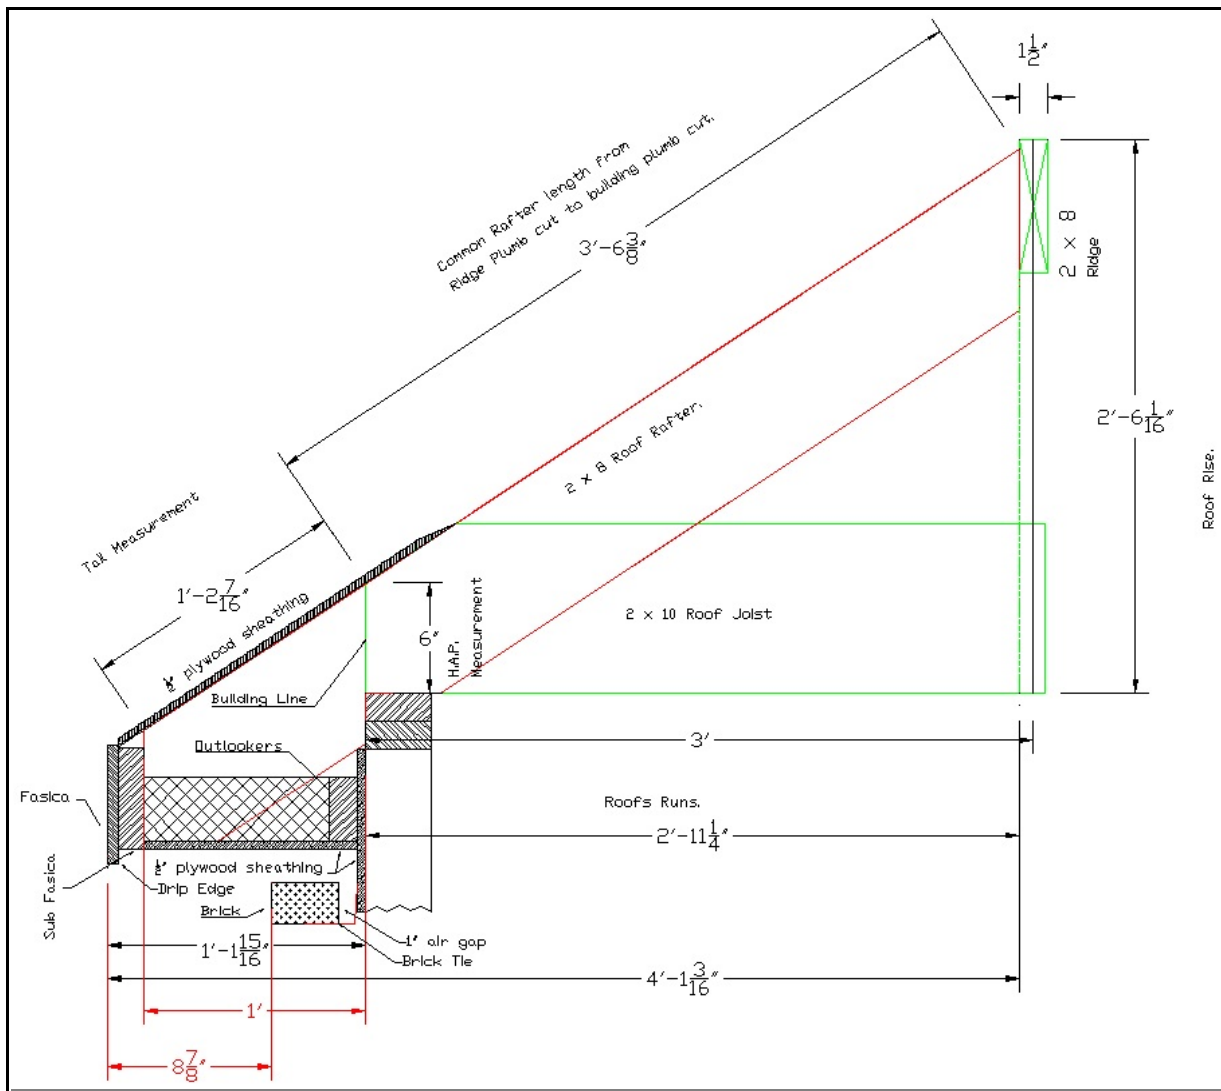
Typical roof overhang detail laid out incorrectly. Illustration by Joseph Fusco
